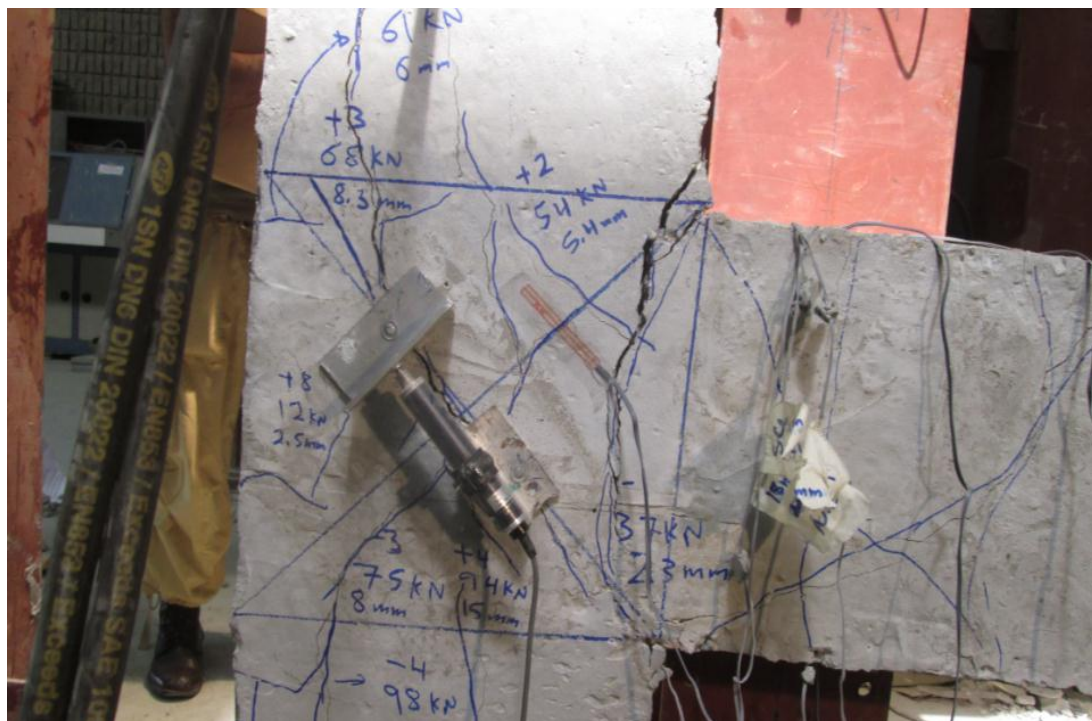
Joint damage of specimen NC-BCJ-S-18MM
